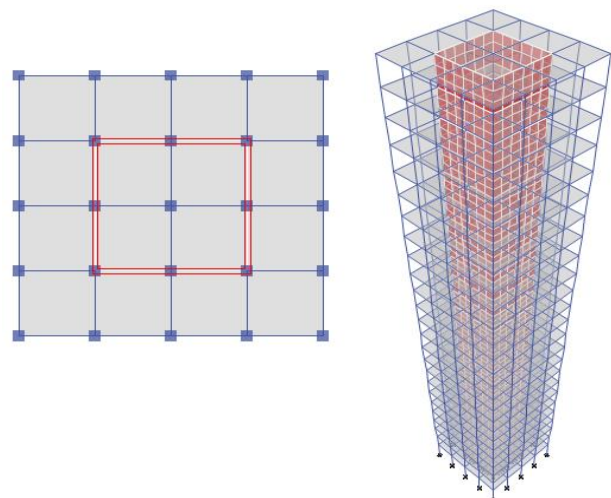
Model III- RCC Building with Shear Wall at Core area.
